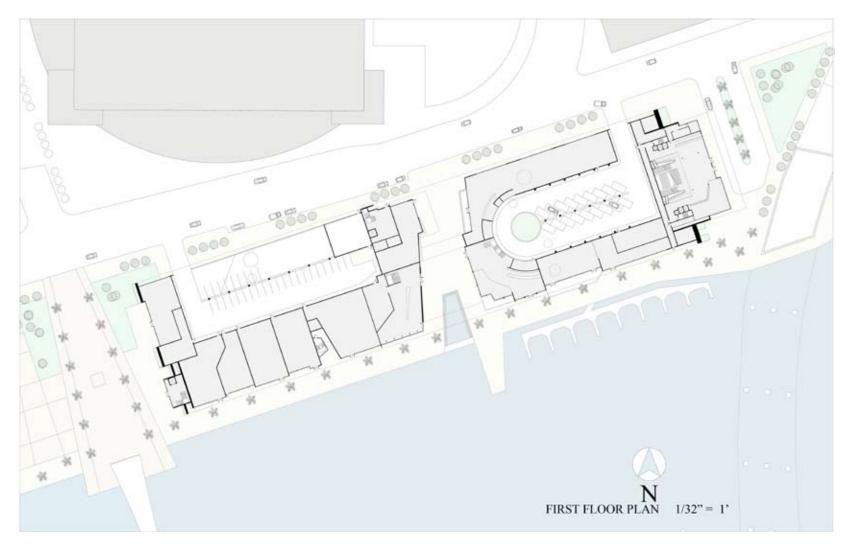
, First Floor Plan, retail spaces, hotel lobby, offices, and service garages.
